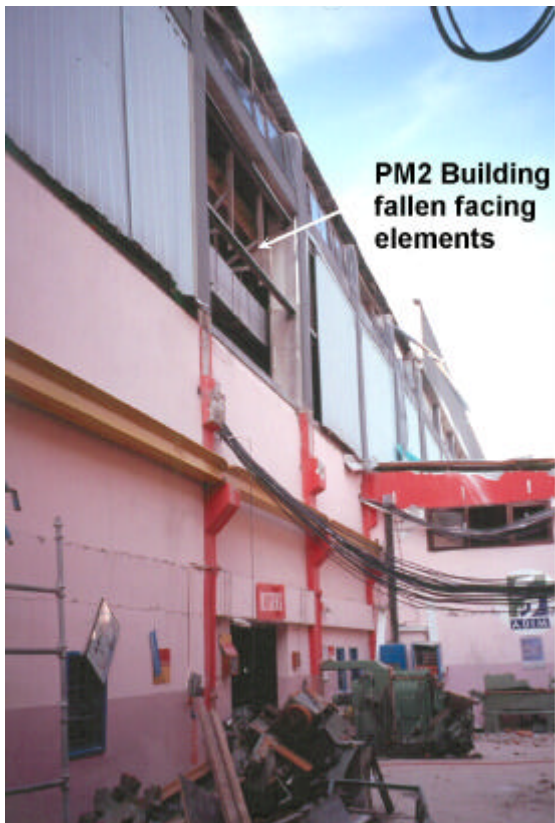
Photograph showing structural damages at PM2 Building due to falling of exterior panel.
